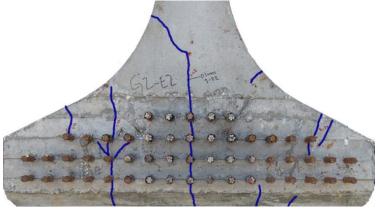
Flange splitting cracks (enhanced) in FIB girder.
